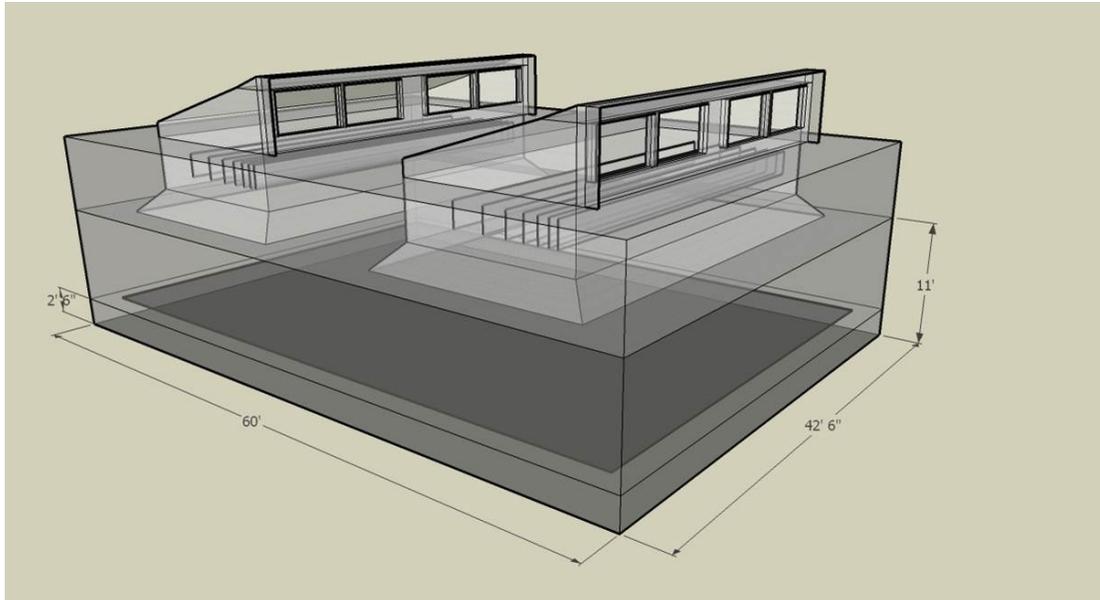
Cafeterias with south-facing roof monitors – view from southwest
